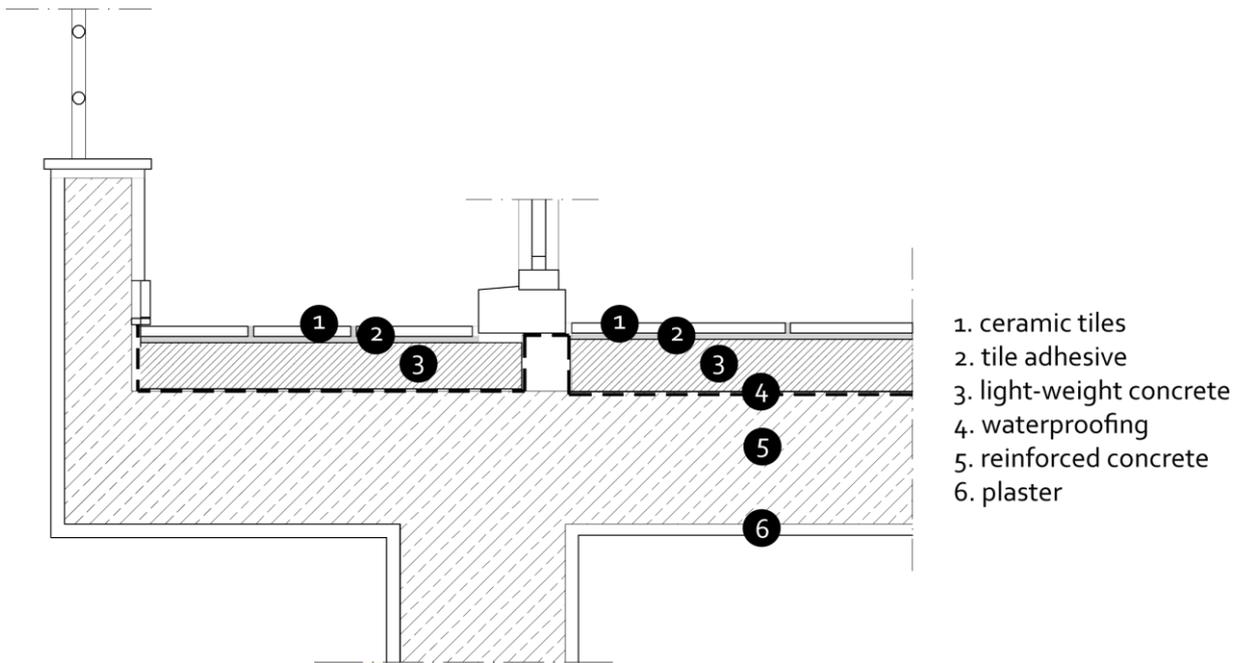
Common practice balconies - Buildings like MF₁, MF₂, MF₃ (161)
